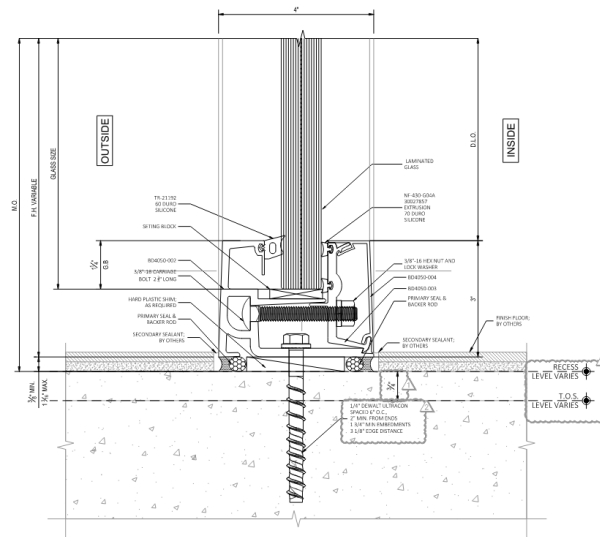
Sill Detail of Balcony Glass Divider Panel Showing Base Shoe, Anchor into Concrete, Shims, and Perimeter Sealant at the Slab Edge.
